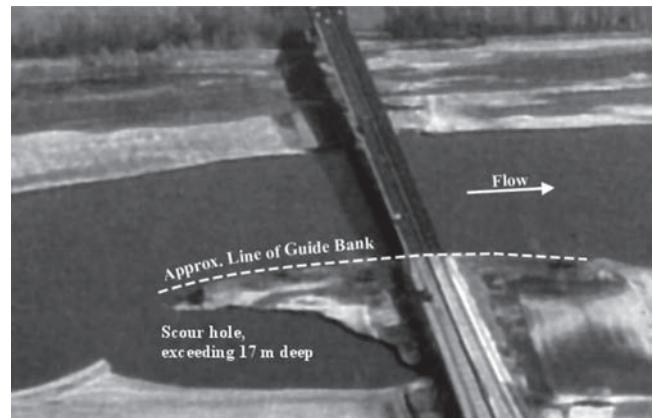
Guide banks at Interstate 70 highway bridge embankment, bridge over Missouri River near Rocheport, Missouri, after 1993 flood.
